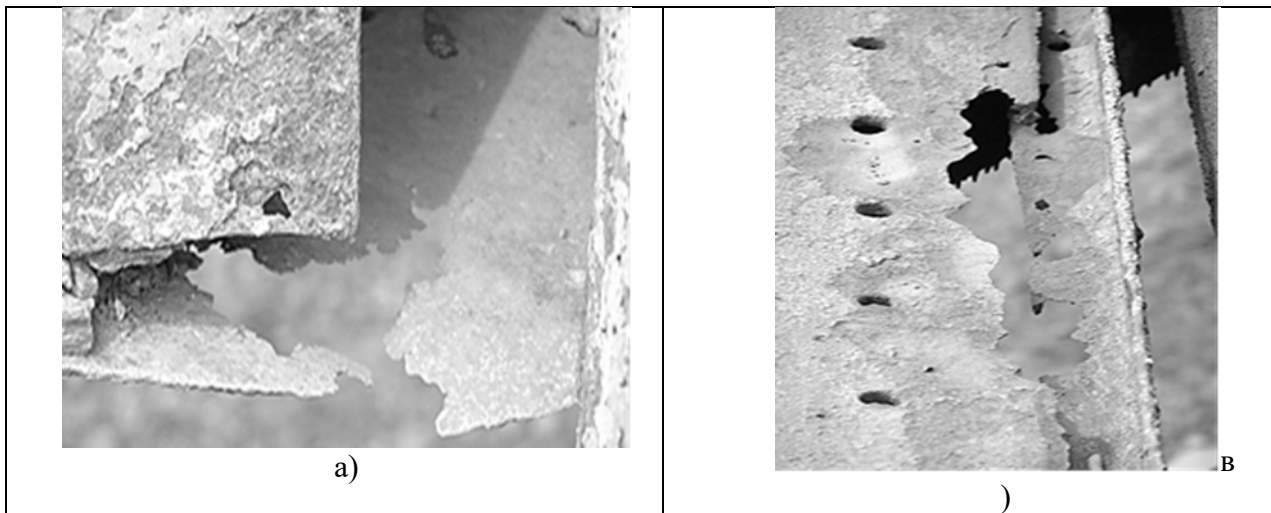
Typical defects and damage to structural elements of the girder structure: a) sheet structures and their connections; b) elements service structures, joints lattice structures.
